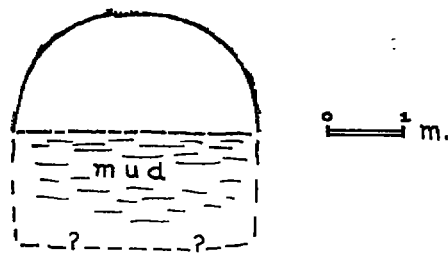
Section of canal tunnel. Below string line, section is conjectural but City Engineers Department suggests walls almost vertical. (N.B. Fig. should show 3 rings of bricks at crown and 2 at sides). Drawing by A. M. ApSimon.
